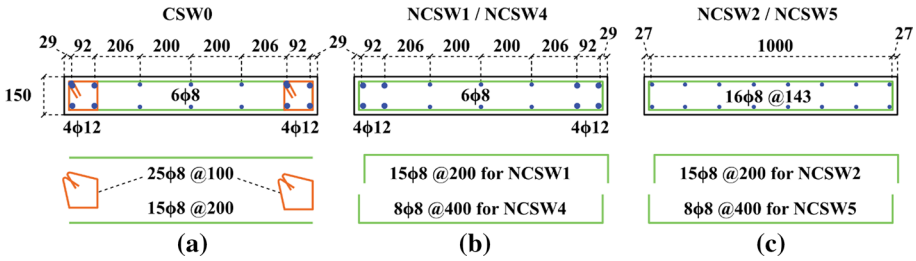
Section details of the test specimens a deformed, b and c smooth steel bars. Dimensions in (mm)
